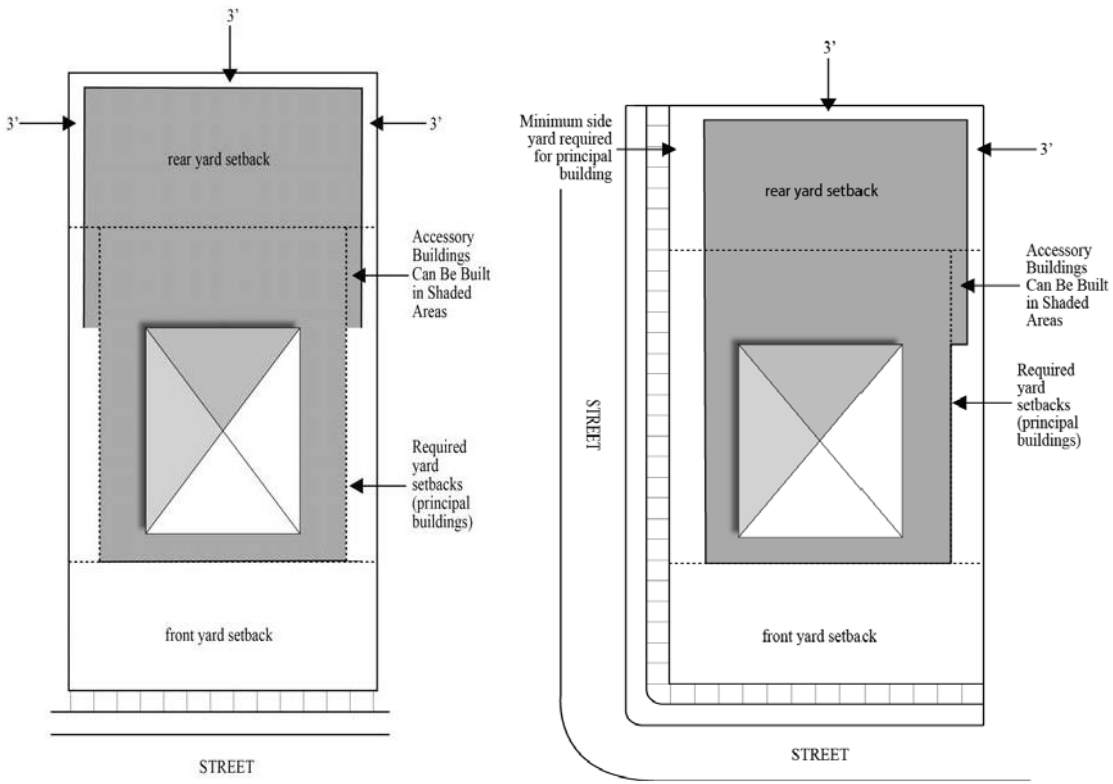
Accessory Building Placement for Reverse Corner Lots. Accessory buildings may be located in shaded areas.
